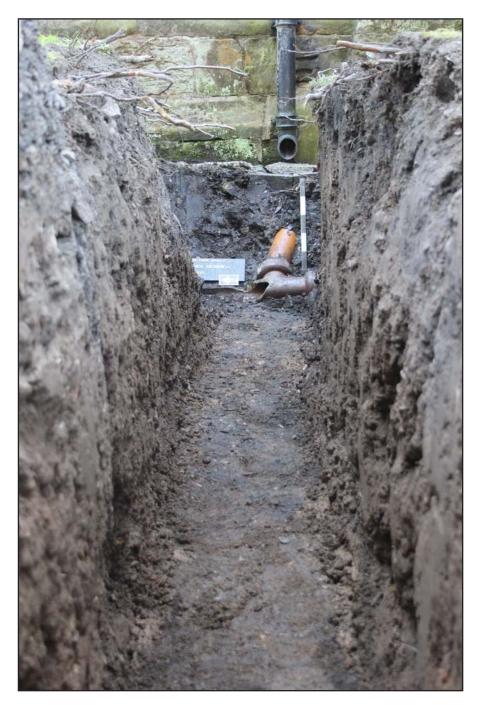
Excavated trench for Drain 3a - from the northeast - scale 0.50m
